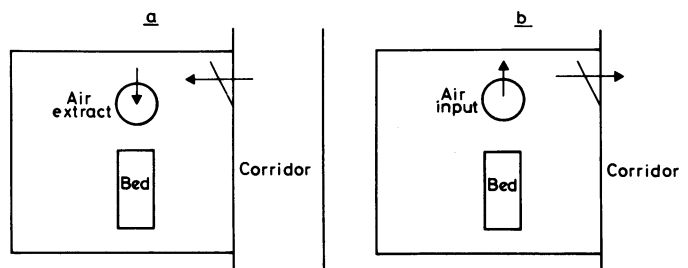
Simple ventilation arrangements for isolation room: (a) extract from room; air enters from the corridor through doorway or gaps around door; (b) input to room; air passes into corridor through doorway or gaps around door.
